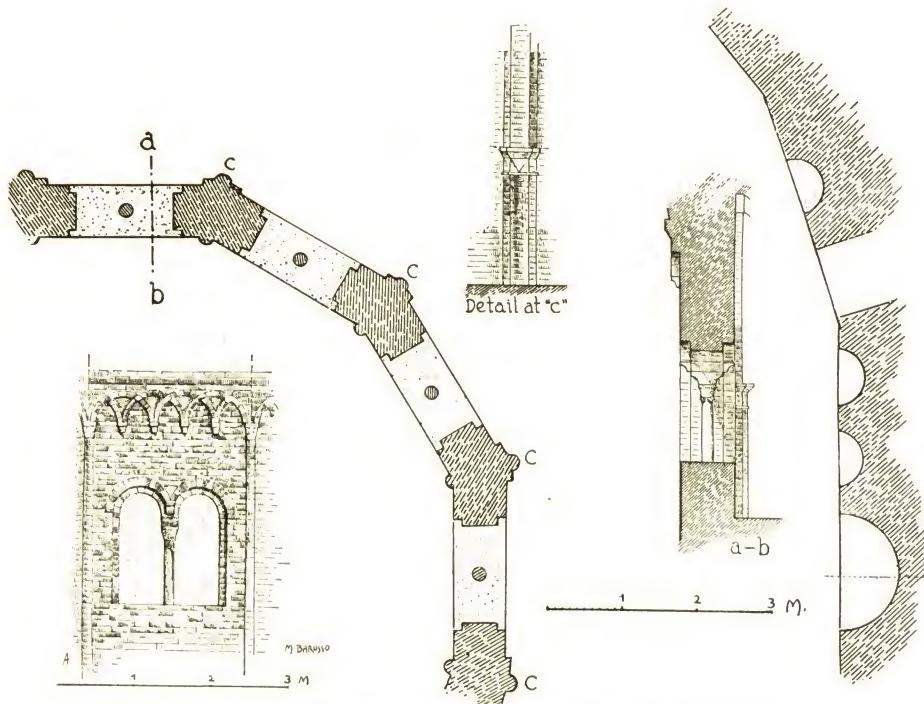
Gallery Plan of San Sepolcro, Inner Pilaster and Section.
